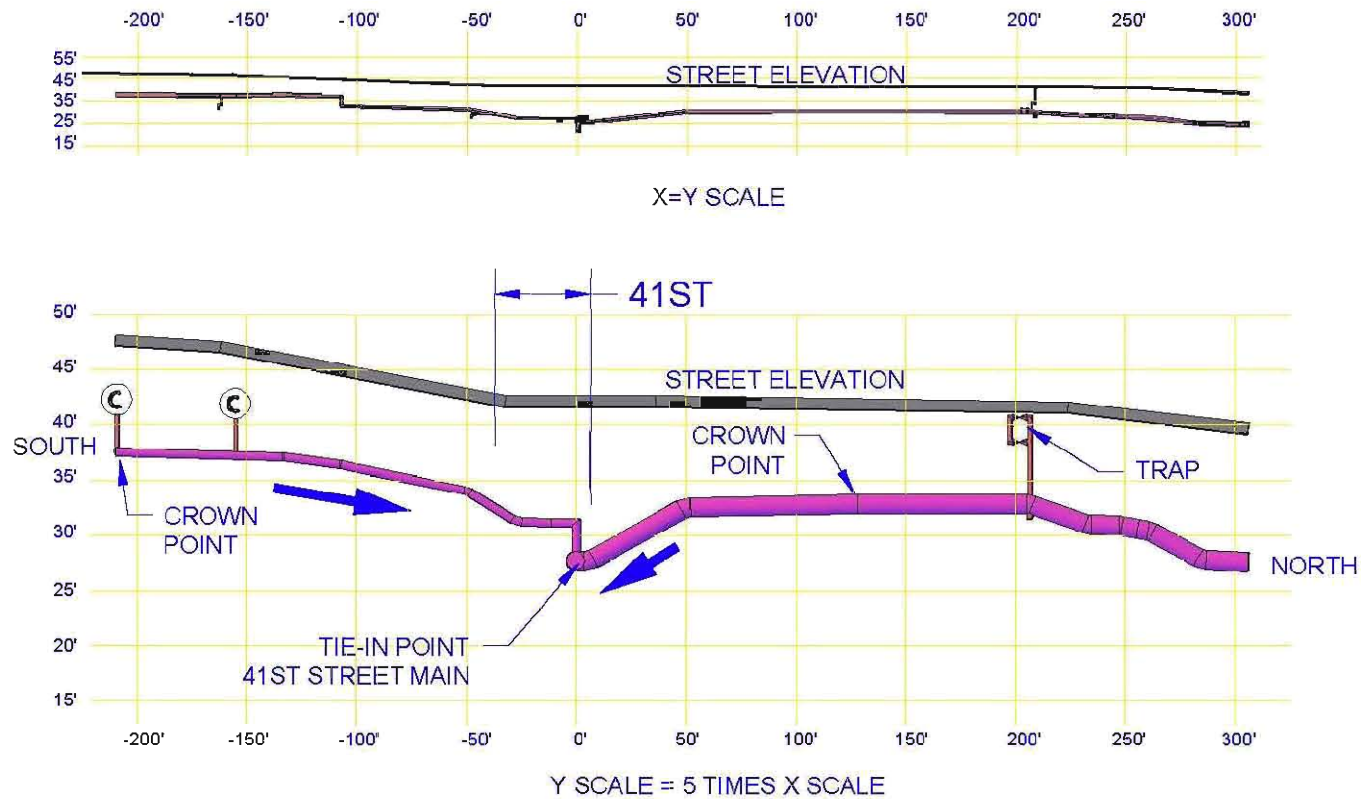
Pipe Elevation Along Lexington Avenue Looking West
